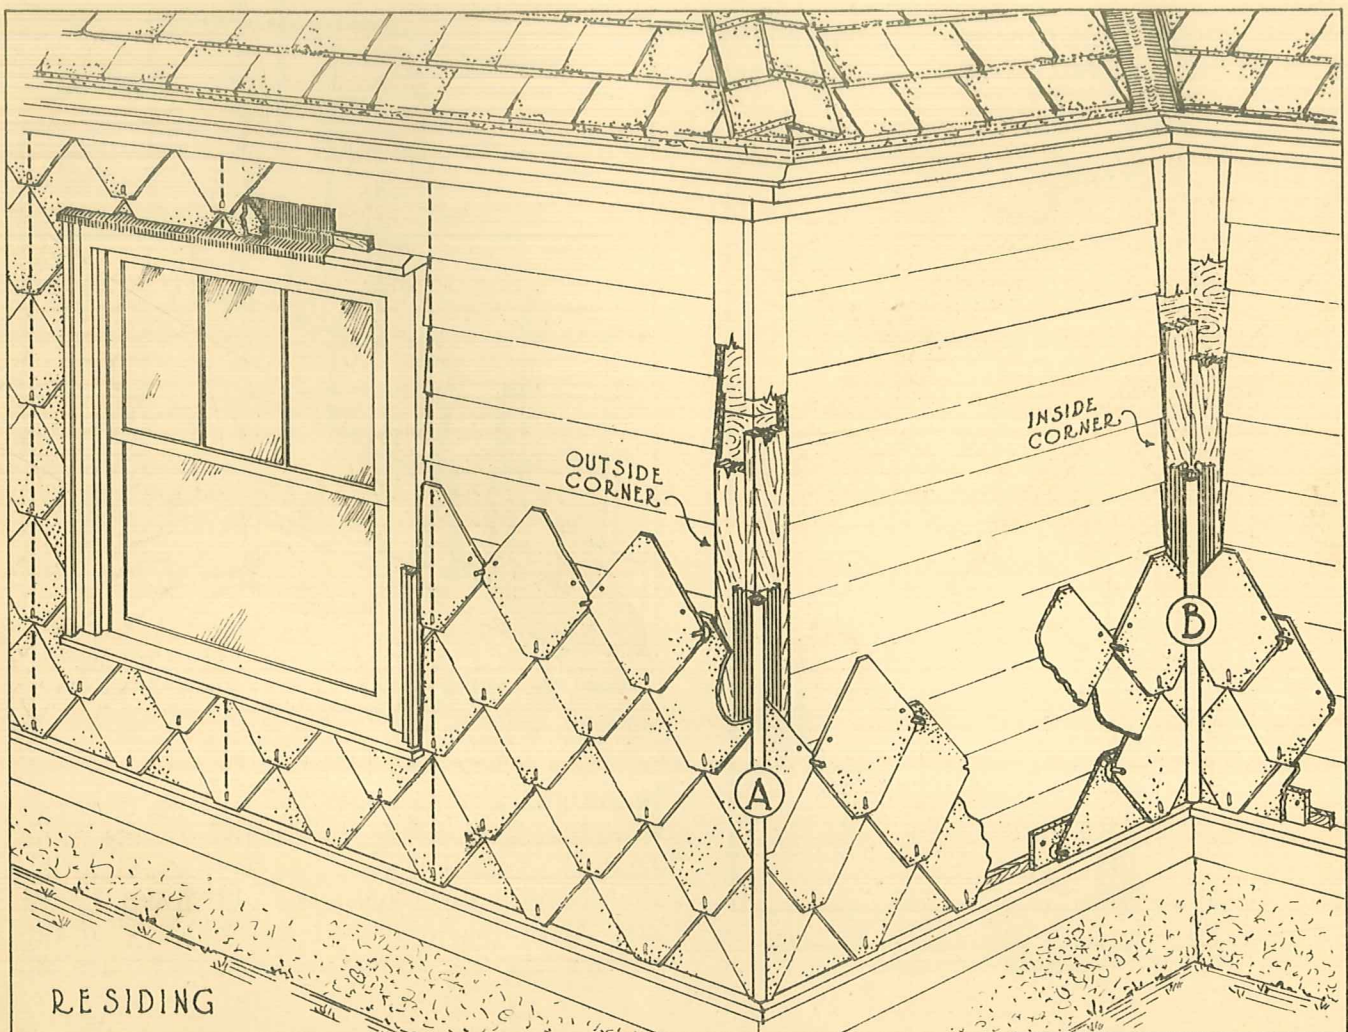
Siding by the Hexagonal Method—showing inside corner, outside corner and detail around window
